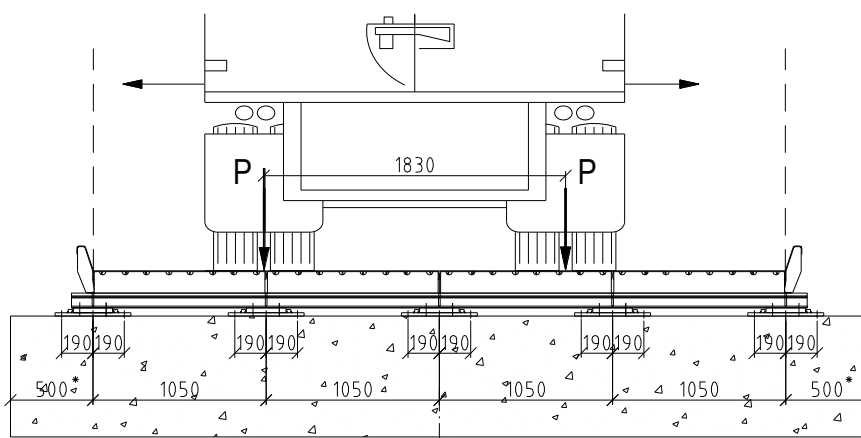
RAMP WITH CONCRETE FOUNDATION - CROSS SECTION
